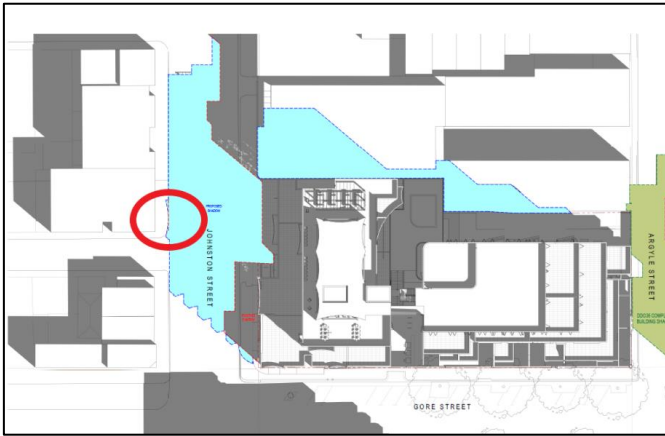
(Shadows to the Johnston Street Footpath, SJB Architects September 2021)
